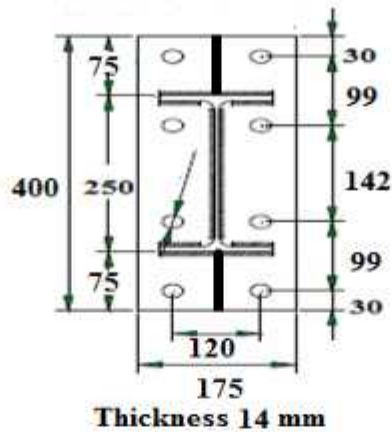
Geometric details of extended bolt stiffened end-plate
